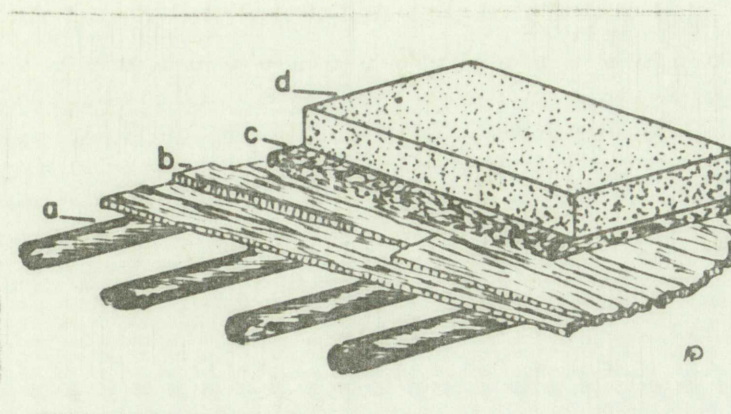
Postulated roof construction of Rooms 1 and 2 at site 27-A (T. 5 N., R. 11 W.); a. roof beams, b. juniper planks, c. twigs and grass and d. adobe.
